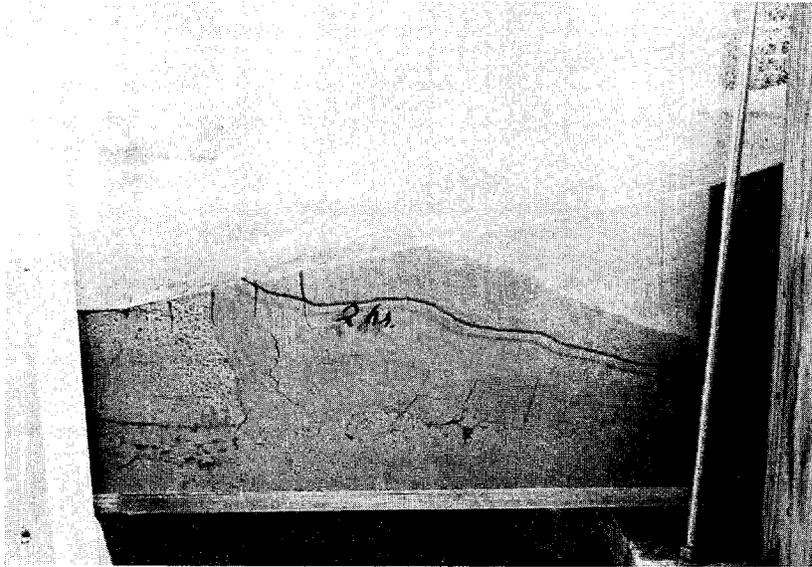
shows the permeation pattern after 17 hours at a head which was maintained constant, close to the top of the passage. Under these conditions, the permeation pattern should closely resemble that for the full scale. Shrinkage cracks have occurred throughout the entire seal.
